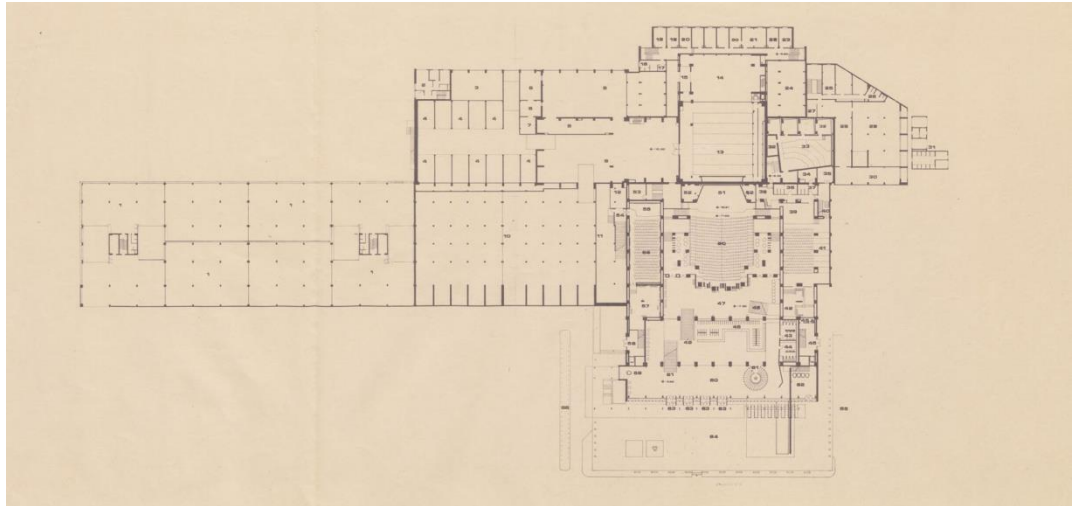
Ground floor plan of Atatürk Cultural Center (AKM)
